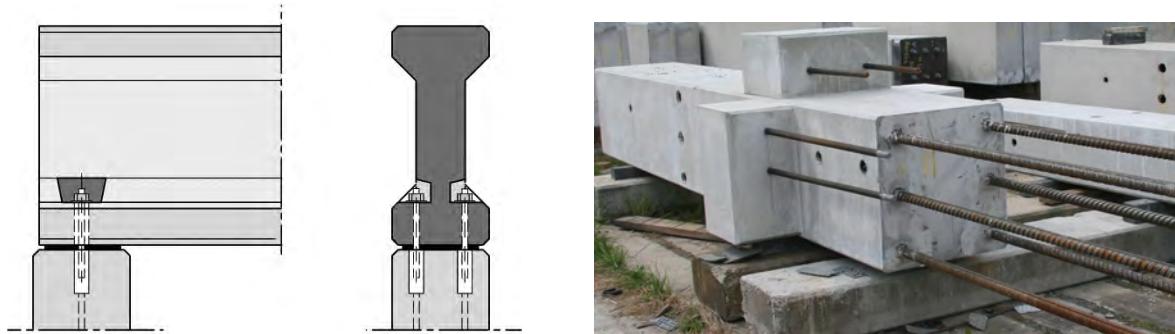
Pinned connection of floor or roof beam and column detail
